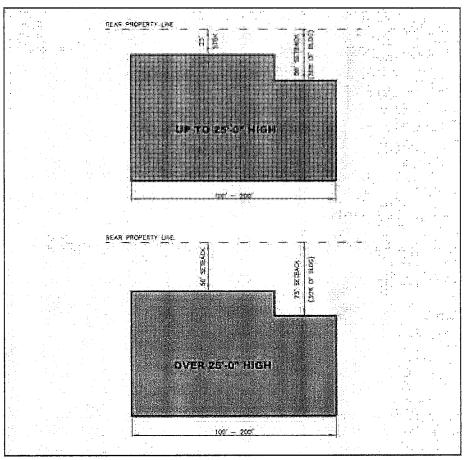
Setbacks for Buildings 100' to 200' wide on East side of Federal Highway
